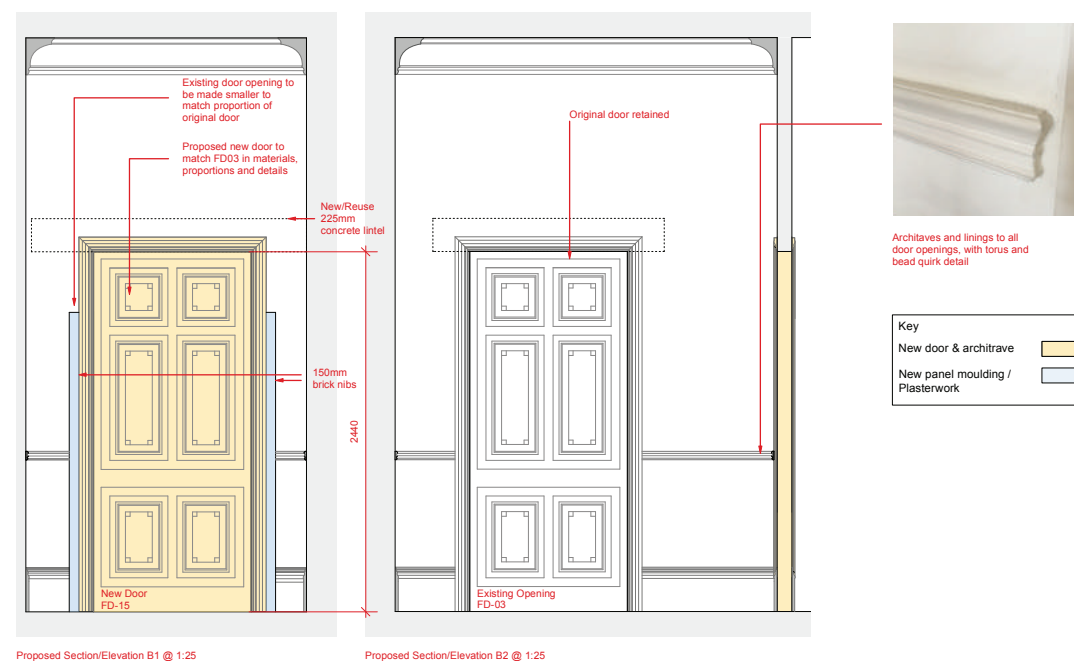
Proposed Elevation B1 & B2 - 2 Flat 2, 5 Cambridge Gate
